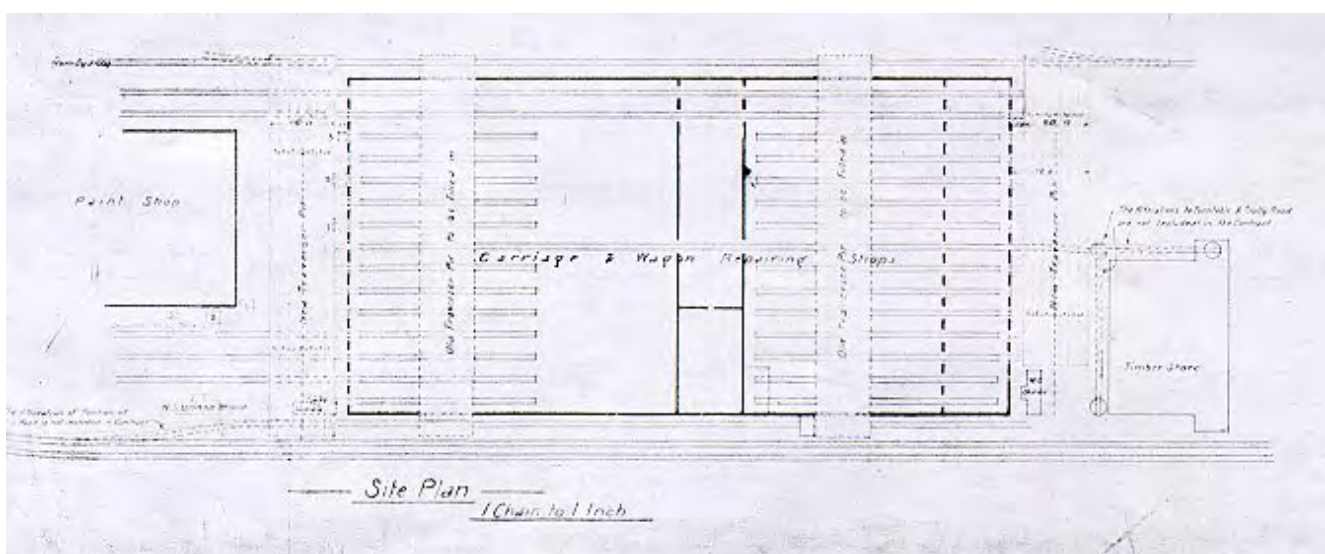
1900 drawing showing proposed removal of the original traversers and construction of the new external traversers.
